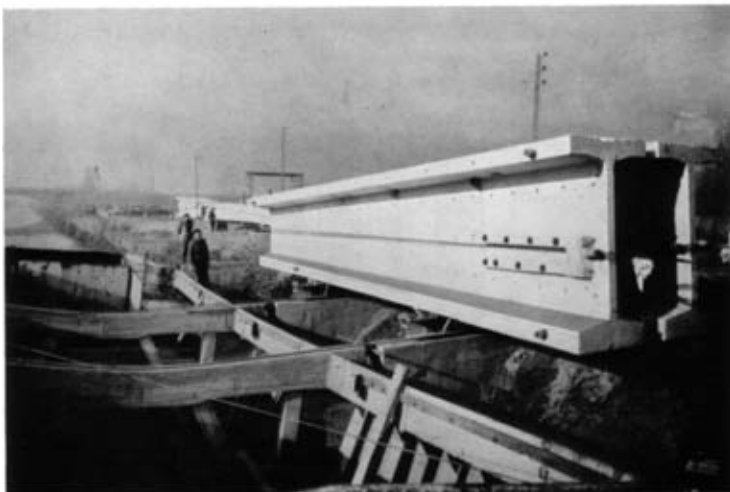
Pre-cast sections of the Esbly bridge showing temporary prestressing for transportation to site.
